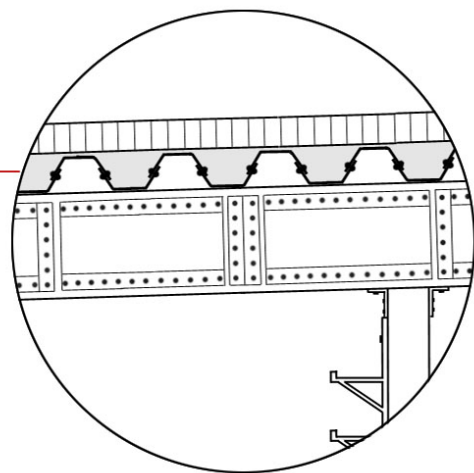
Detail of the corrugated roof, constructed from a series of longitudinal sheets of U-shaped cross section which were riveted together (*0.2m scale*)
